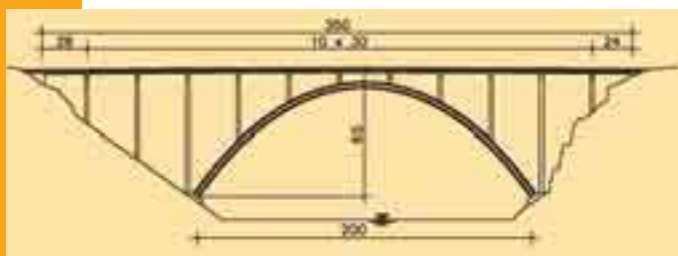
Longitudinal layout of the bridge over the Pazinčica abyss
